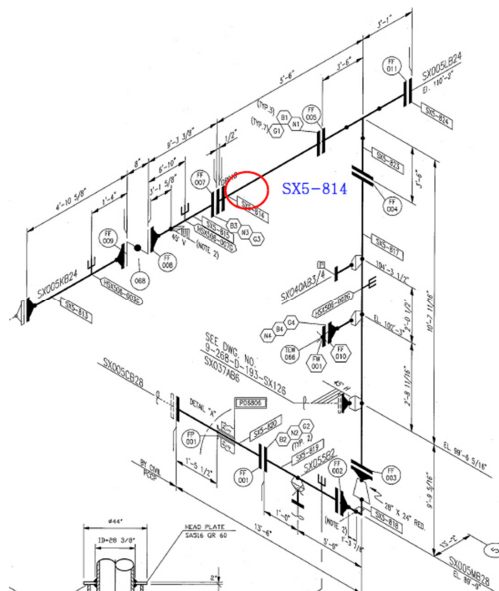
Isometric drawing of the damaged pipe.
